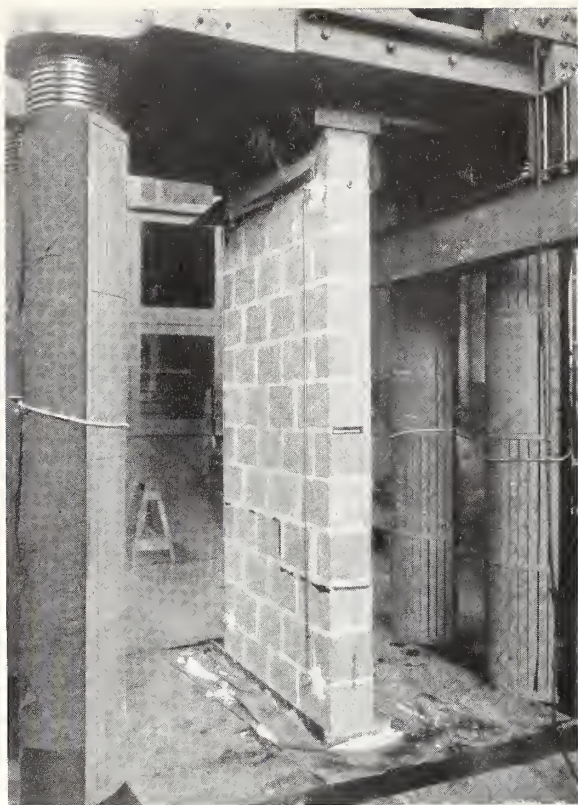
Wall specimen AF-C1 under compressive load.
